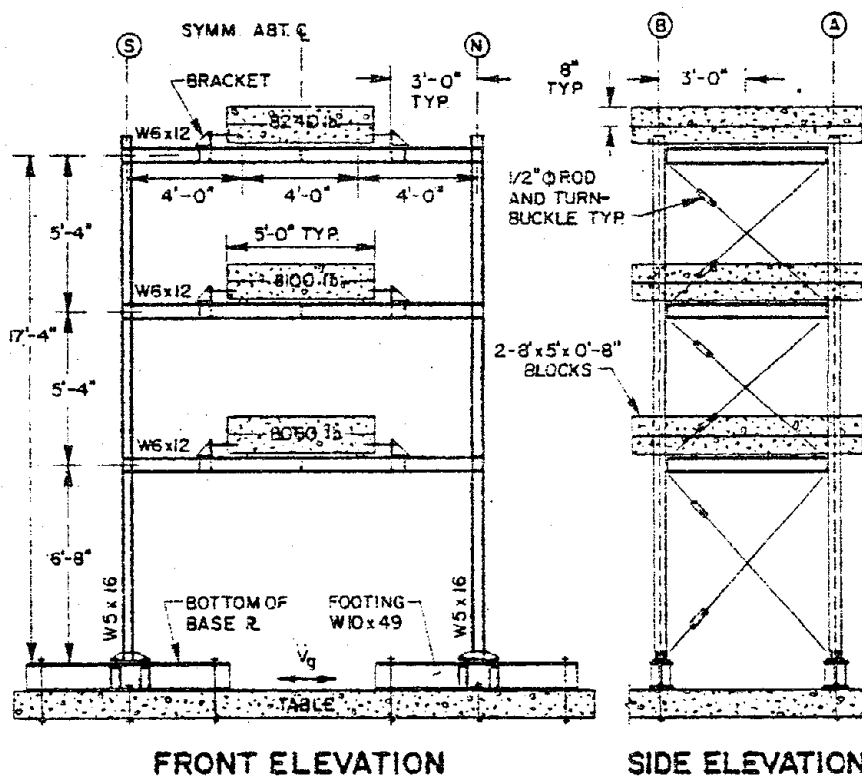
ELEVATIONS OF TEST STRUCTURE
